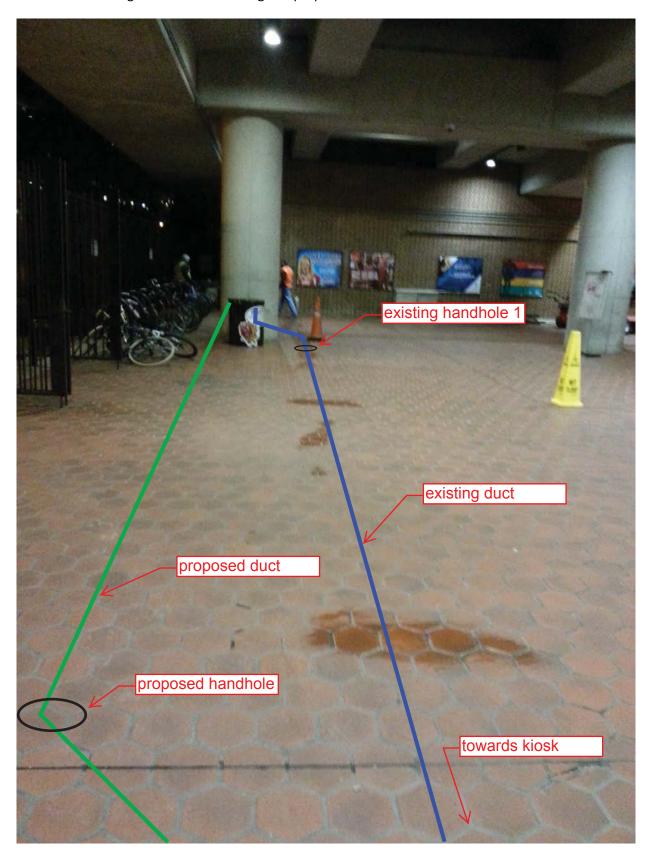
C13 King Street South: Existing and Proposed Duct runs at door to backroom
